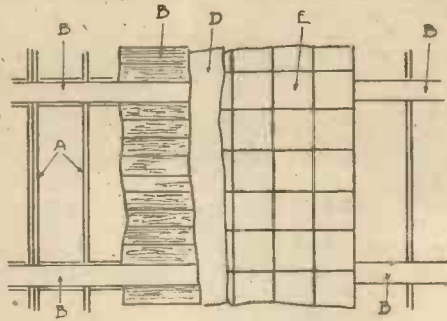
FLAT ROOF UNITS WITH SITE-APPLIED PAVING TILES ON WATERPROOF SHEET MATERIAL.
